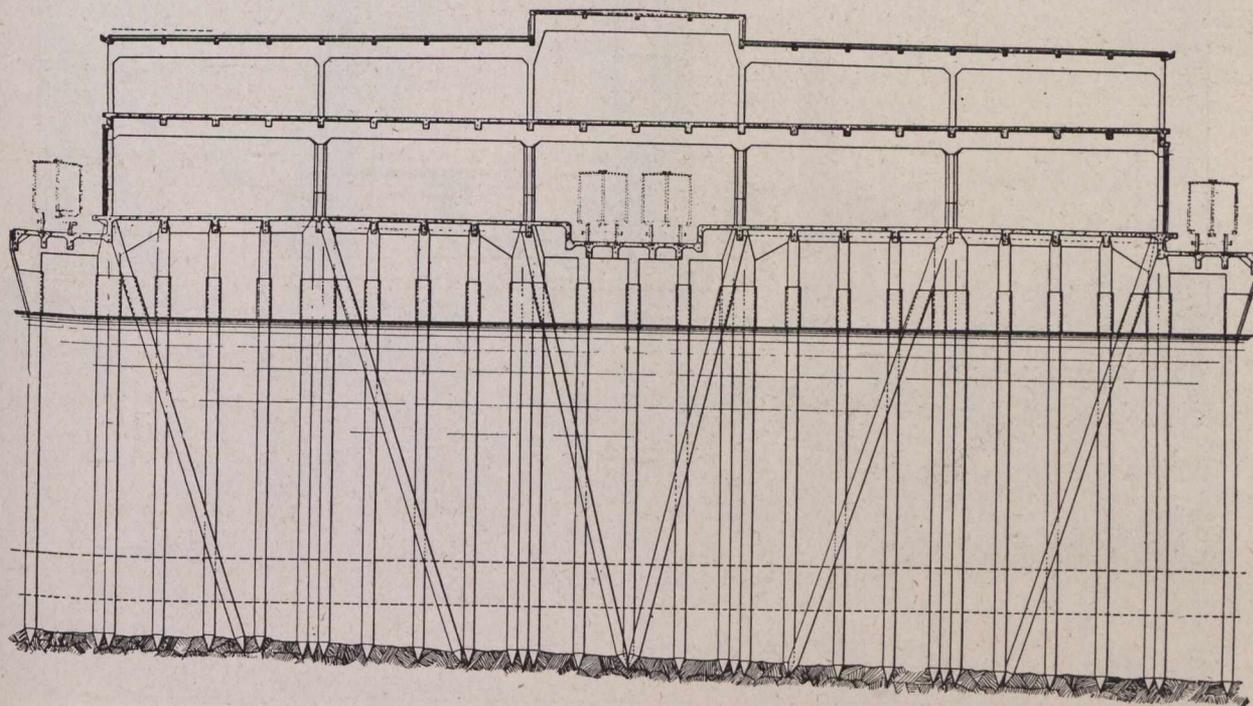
Transverse Half-Section of Pier, Showing Arrangement of Brace Piles.
